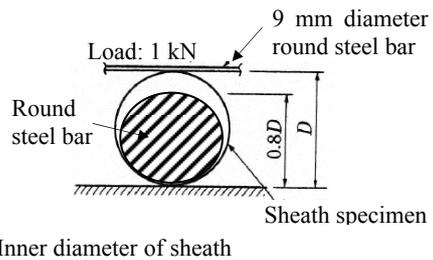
Sheath specimen for testing resistance to local external force
